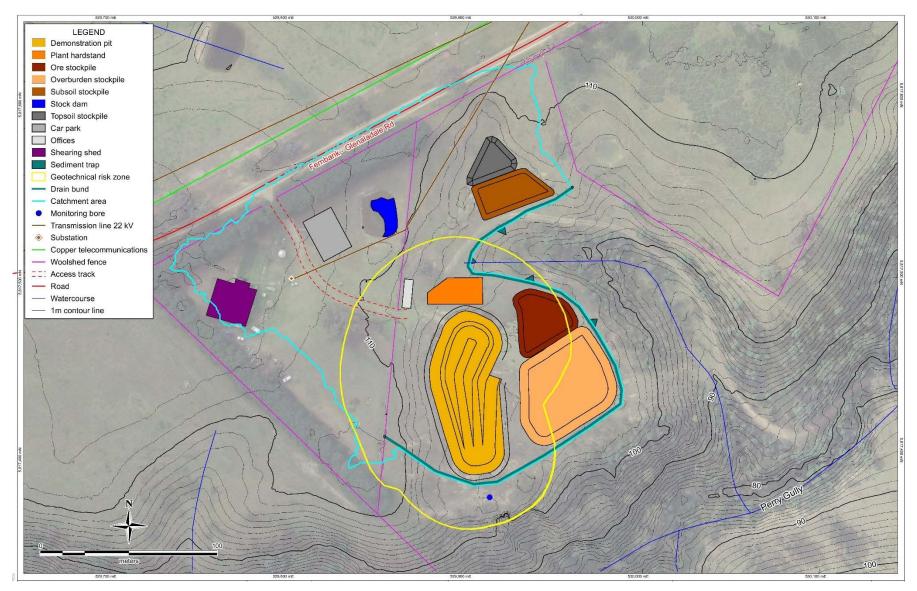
Site plan showing trial pit, stockpiles stockpile pit and ore processing areas
